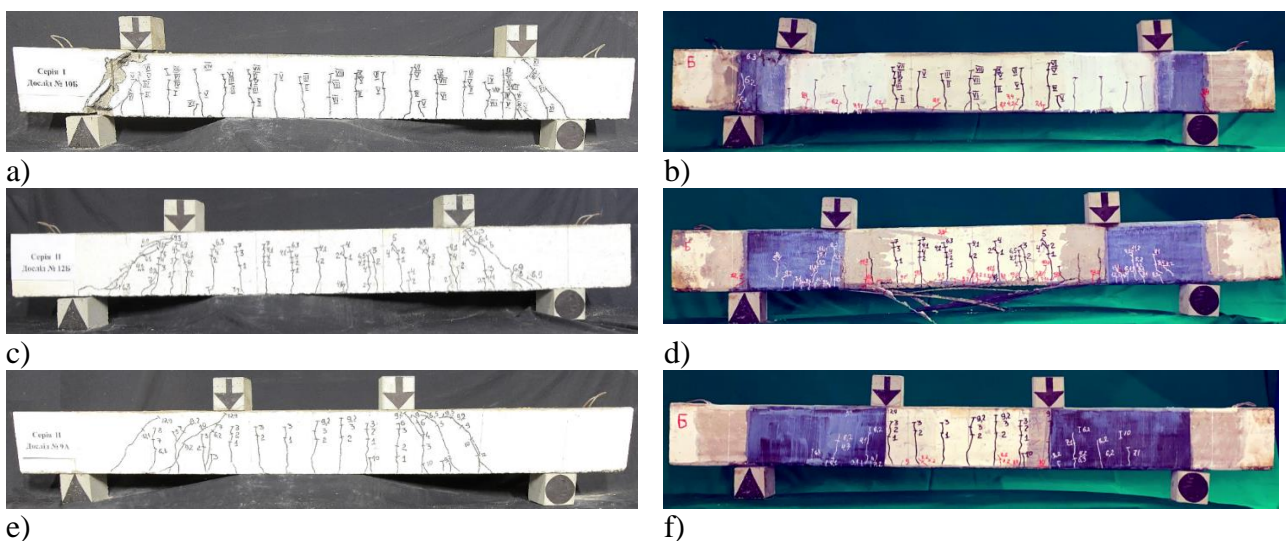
The nature of crack formation and destruction of concrete beams with BFRP before (a, c, e) and after (b, d, f) their reinforcement with carbon fiber web in the lower stretched zone and in near-support areas with small, medium and large shear spans
